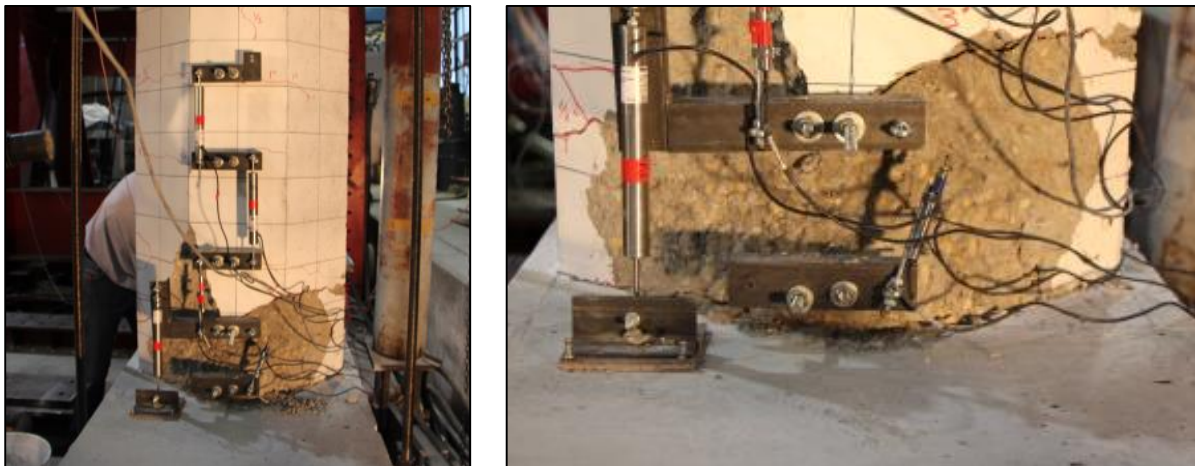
Damage state for FGSS-CIP at 6% drift ratio: cracks and spalling, yield penetration.
